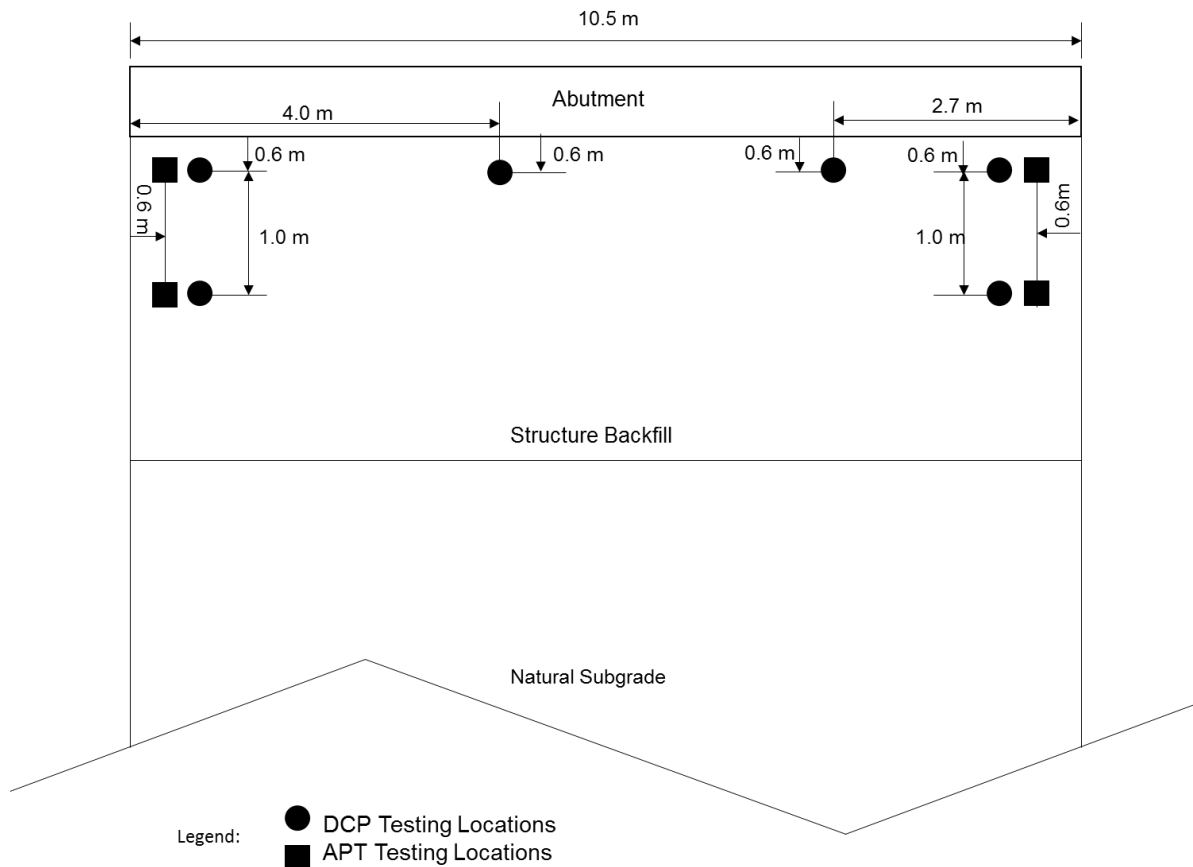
Plan view of the bridge abutment showing APT and DCP test locations at Schwartz Road Bridge
